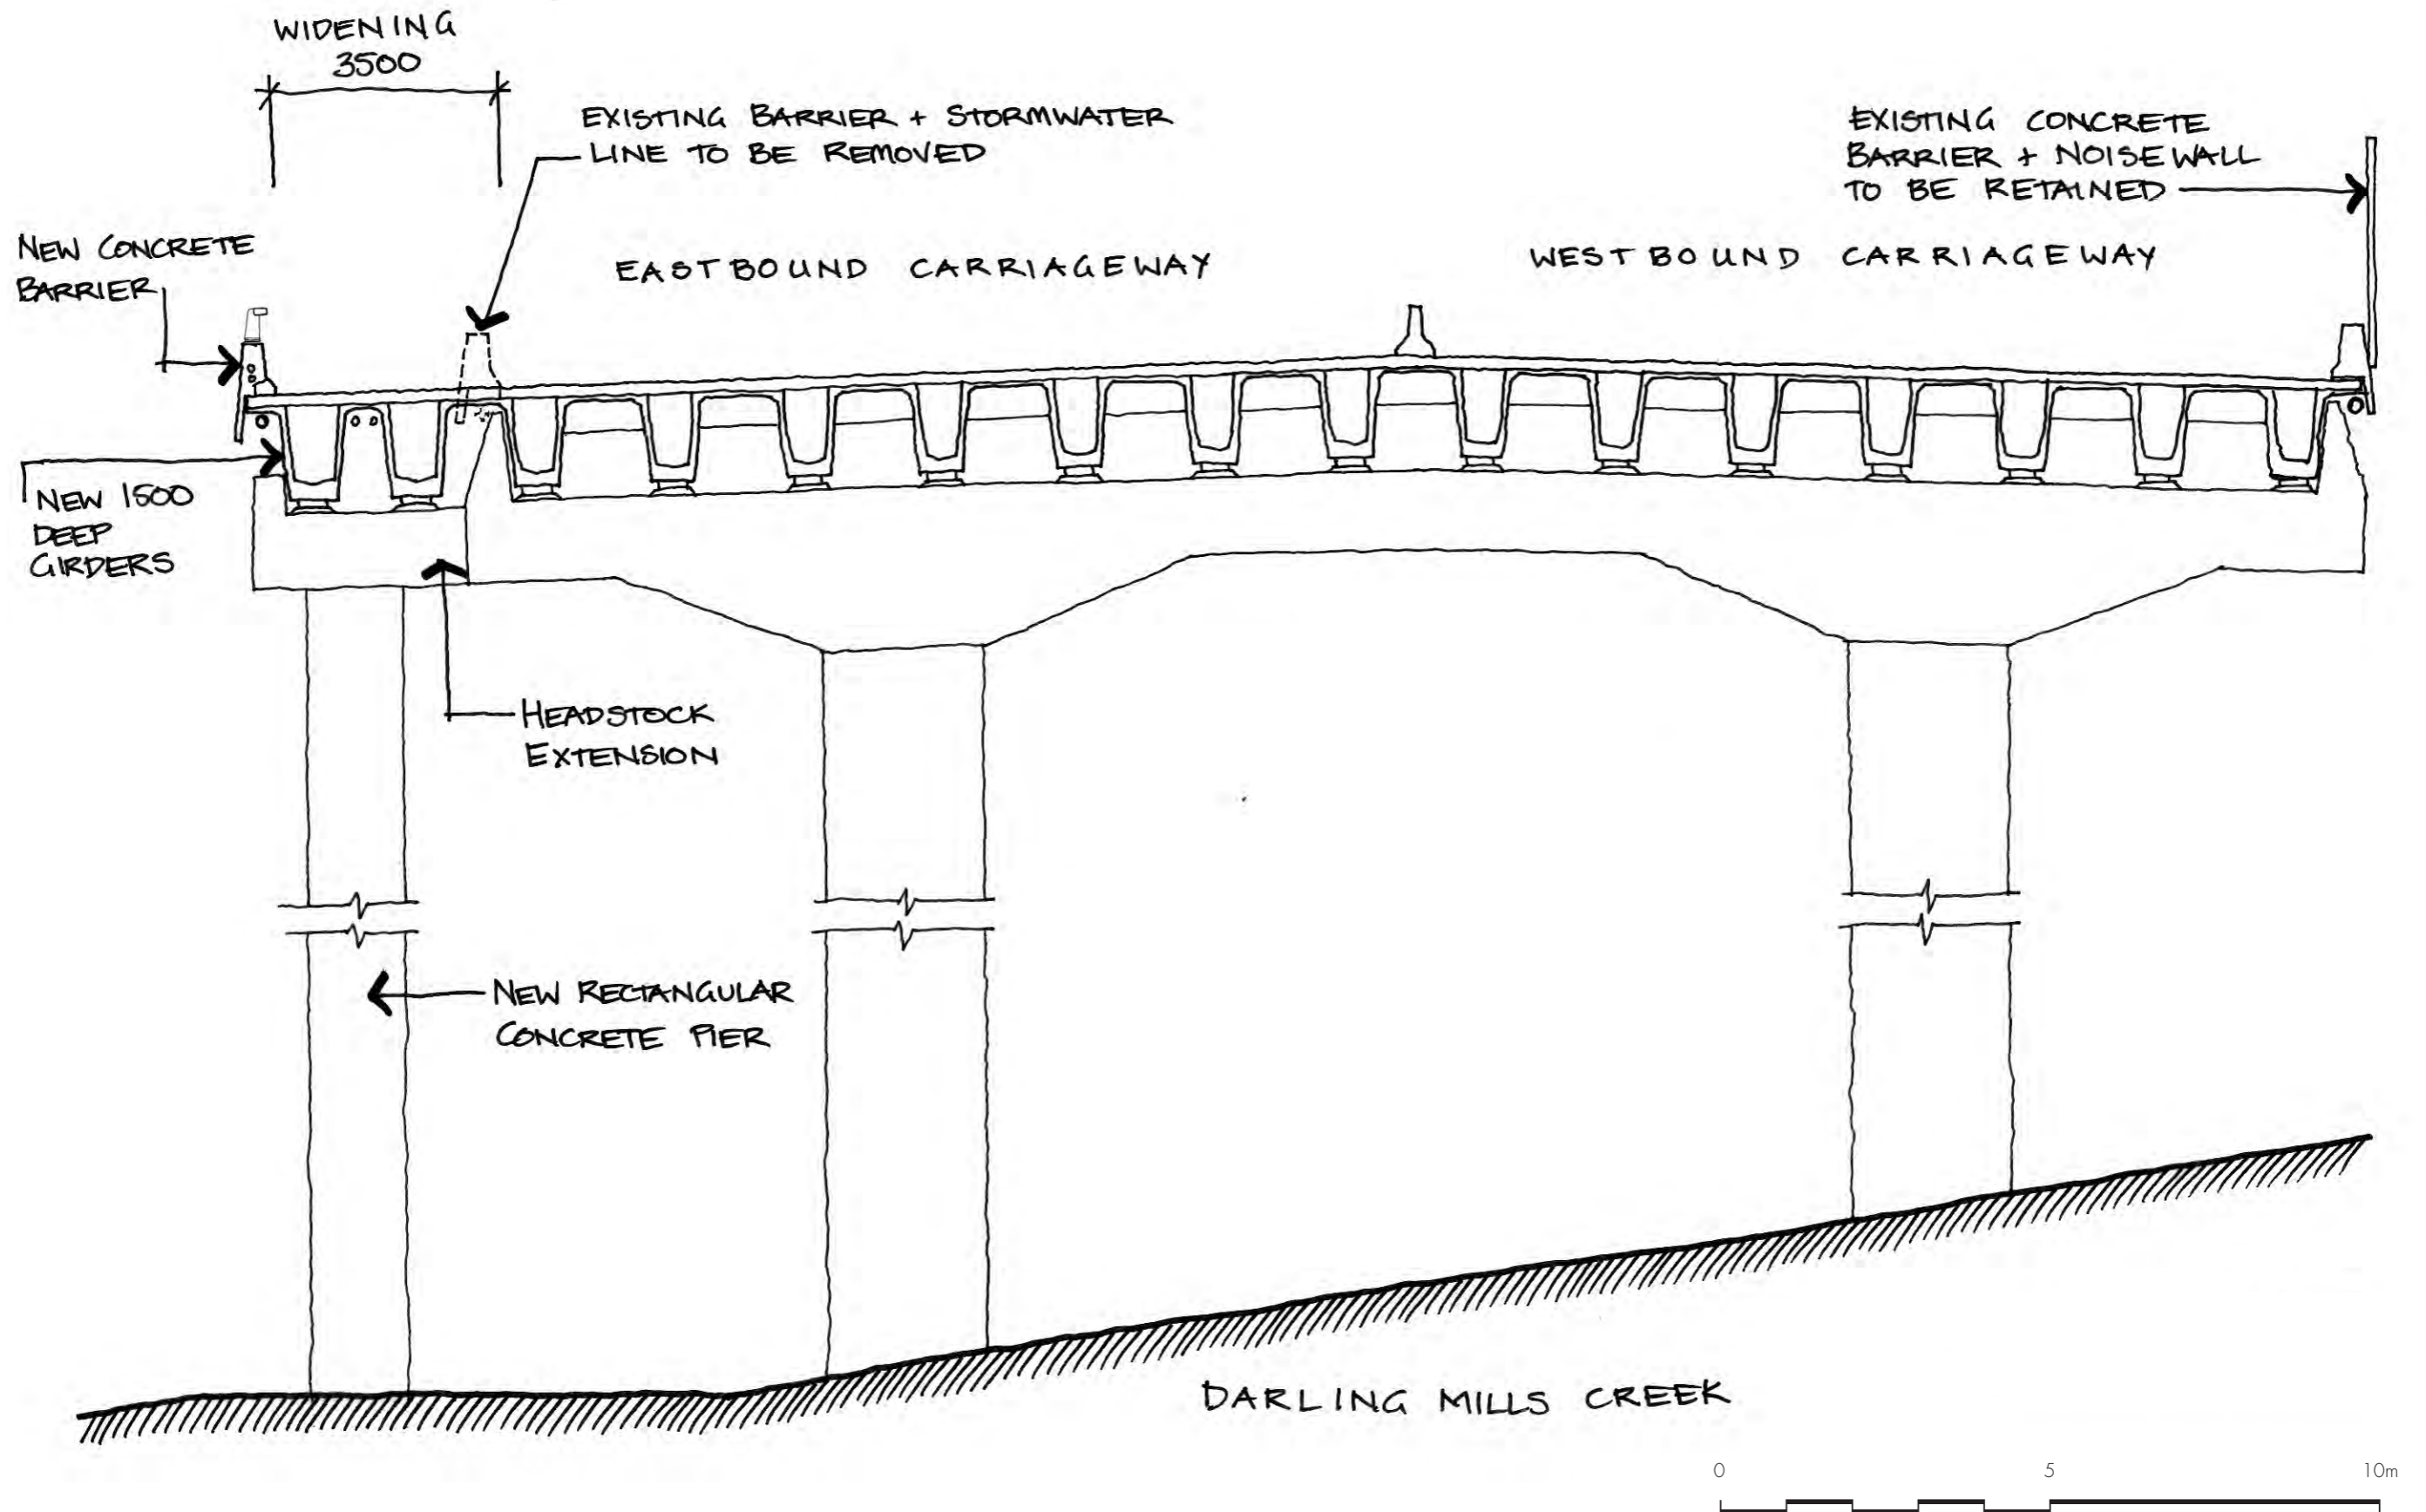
Bridge 2.1 Darling Mills Creek Bridge - Cross Section
